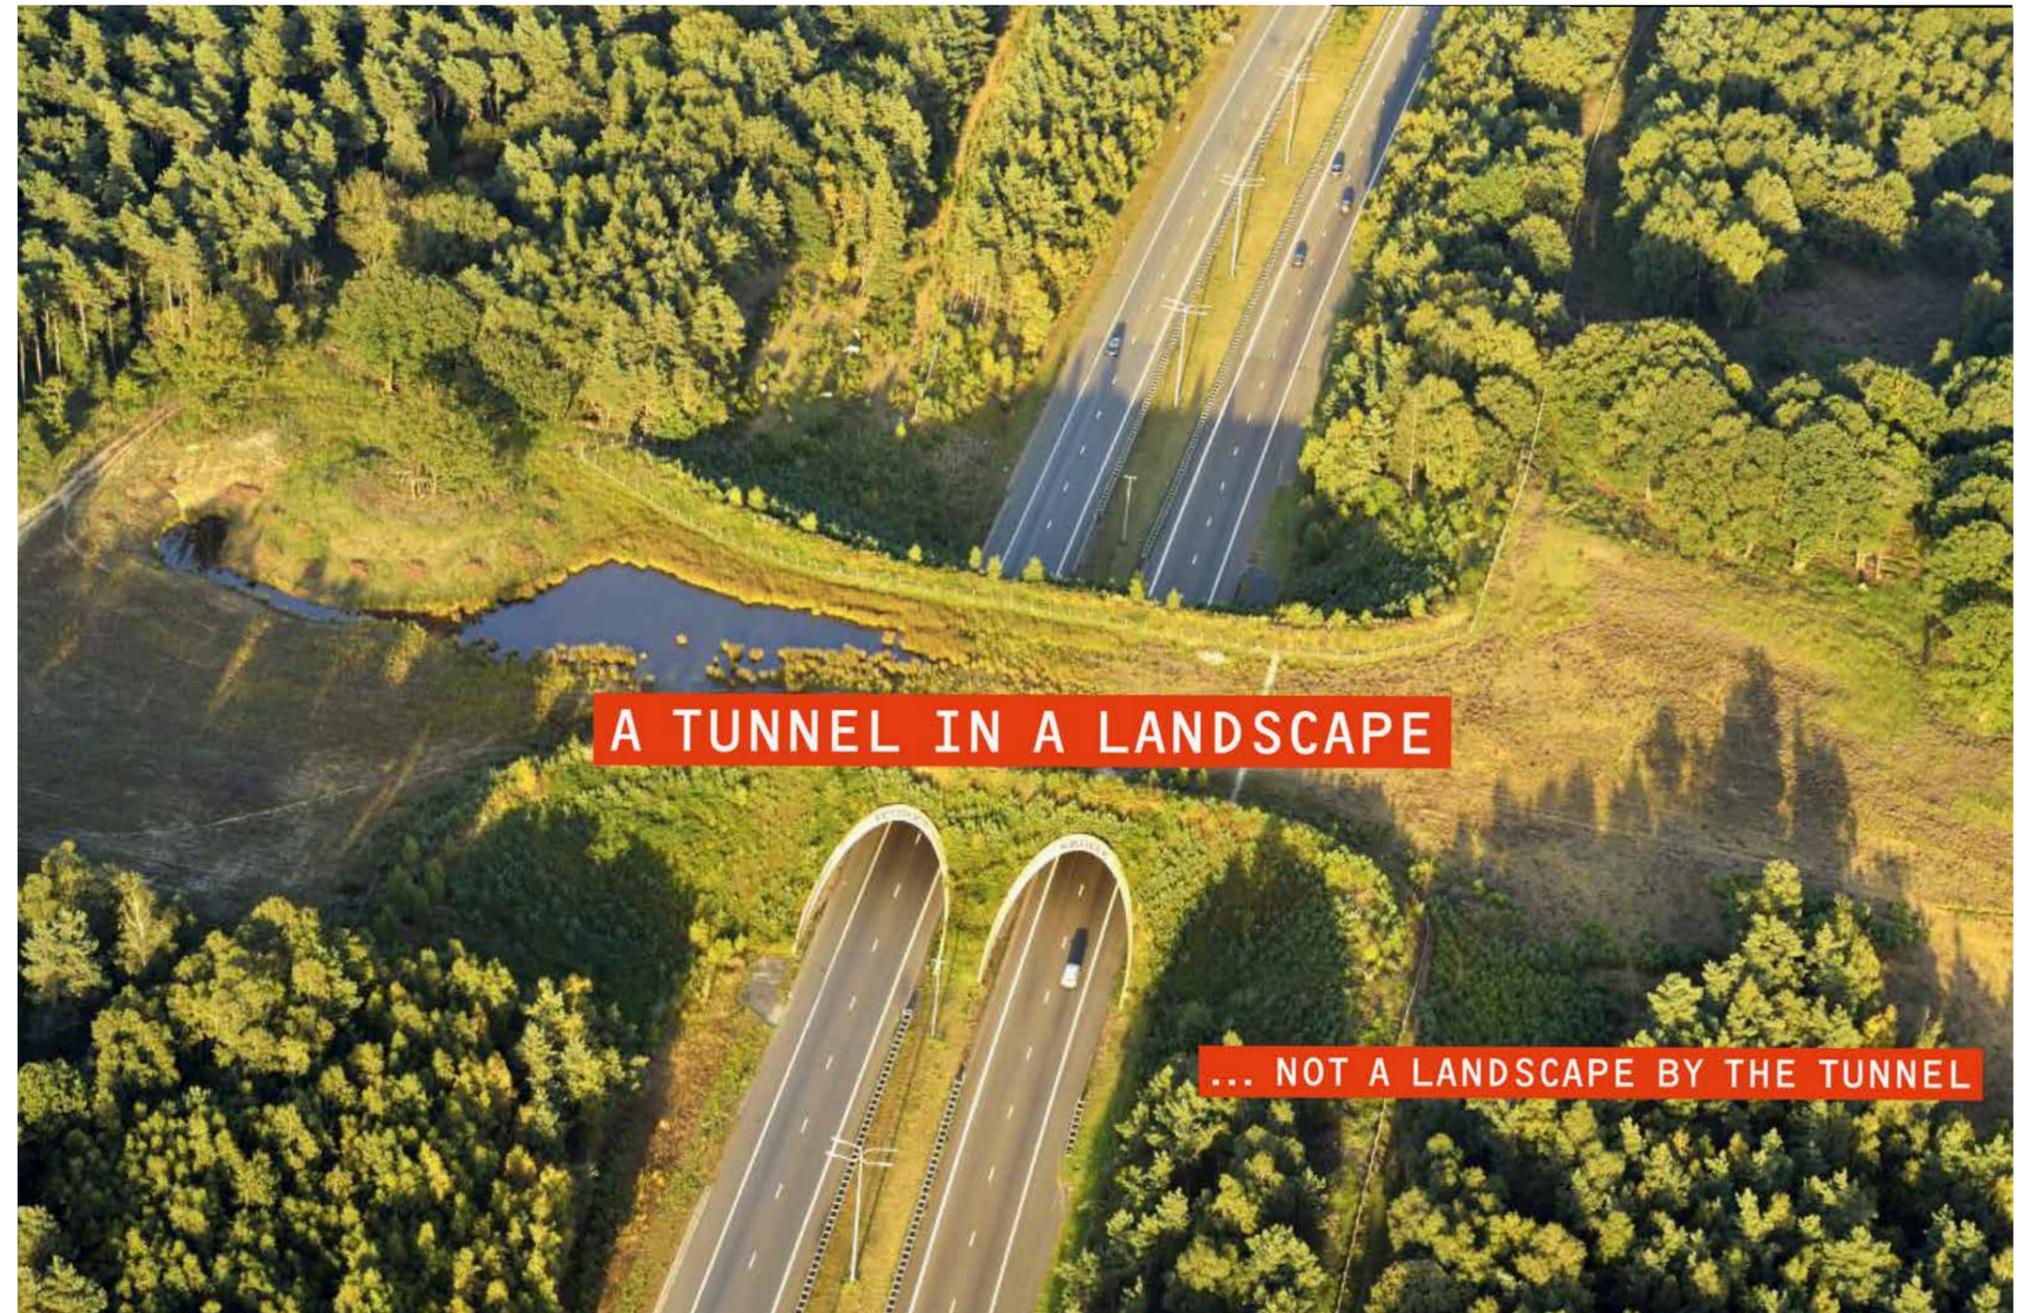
Silvertown Tunnel concept proposal at Tender Stage
